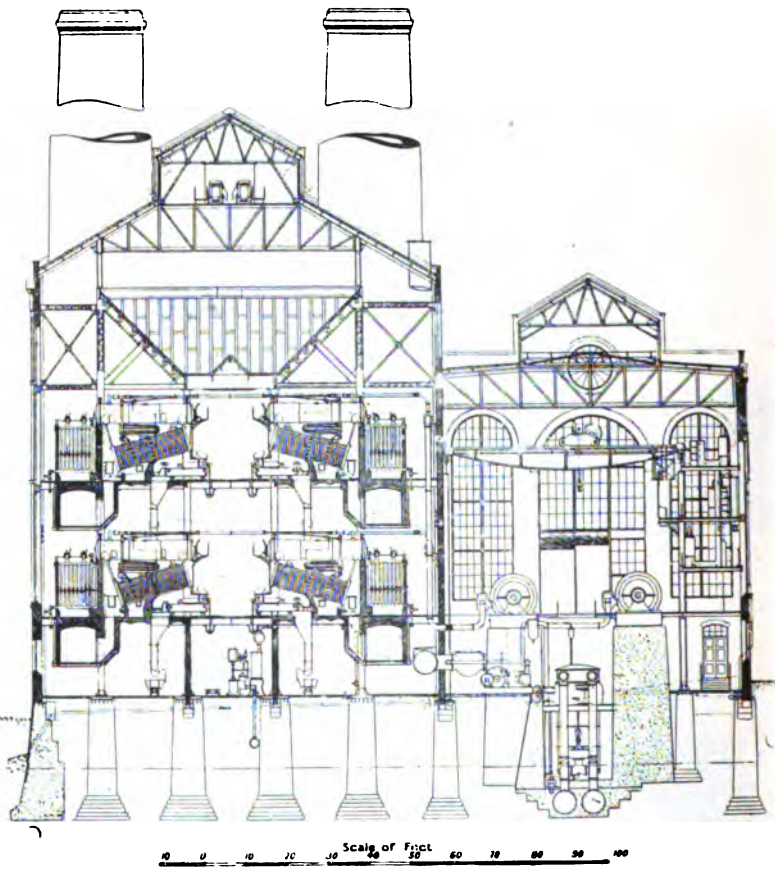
Lots Road, Chelsea : Sectional Elevation.
